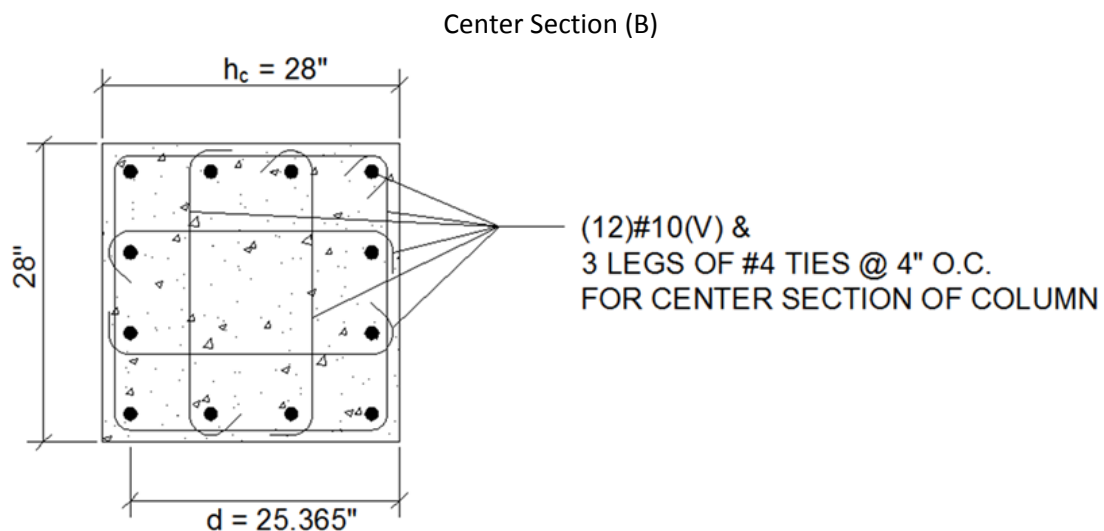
Exterior column, cross-section at center section of column at ground floor level based on tsunami design requirements.
